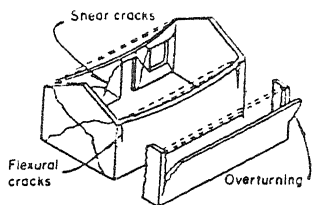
Modes of failure of unreinforced masonry houses
